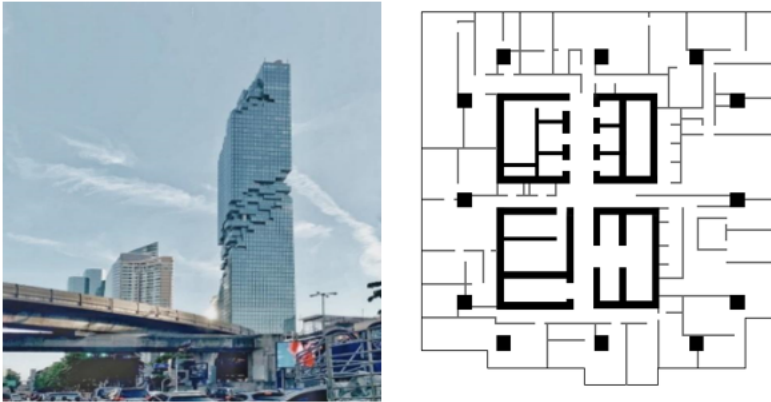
MahaNakhon, Bangkok, 2016 (source: Wikipedia) and typical floor plan
